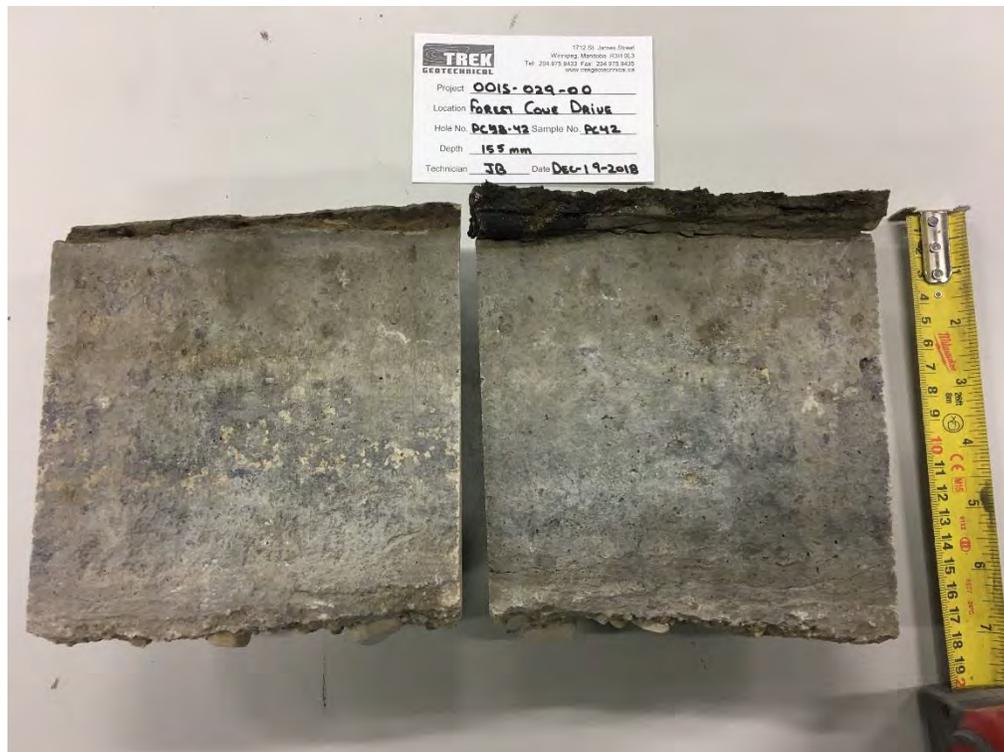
Pavement Core Sample view of Joint at Test Hole PC18-42
